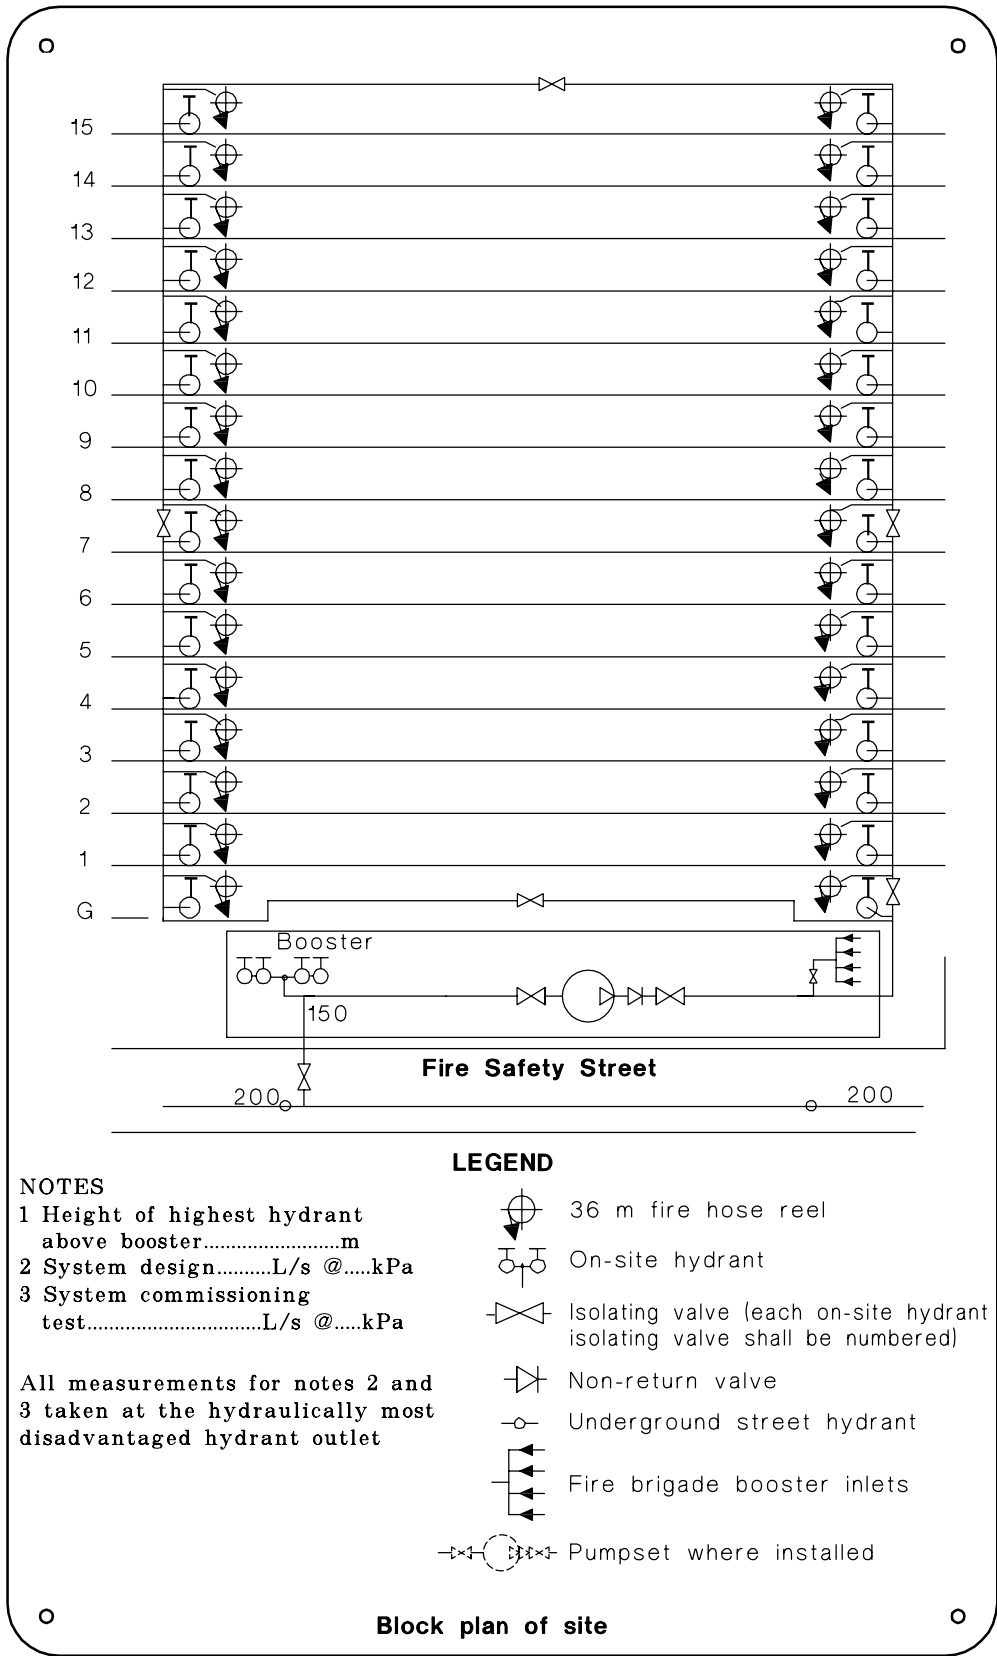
(in part) TYPICAL BLOCK PLAN
